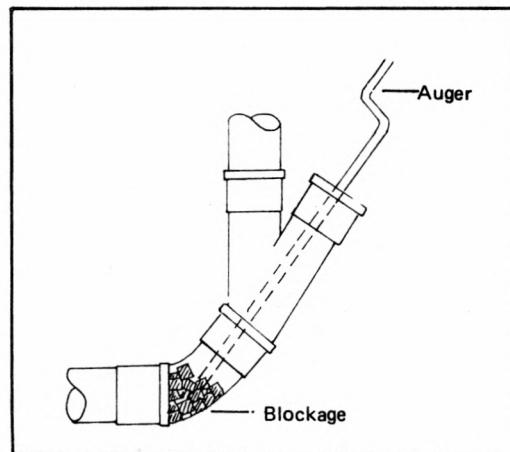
CLEARING BLOCKED TOILET WITH TOILET AUGER
